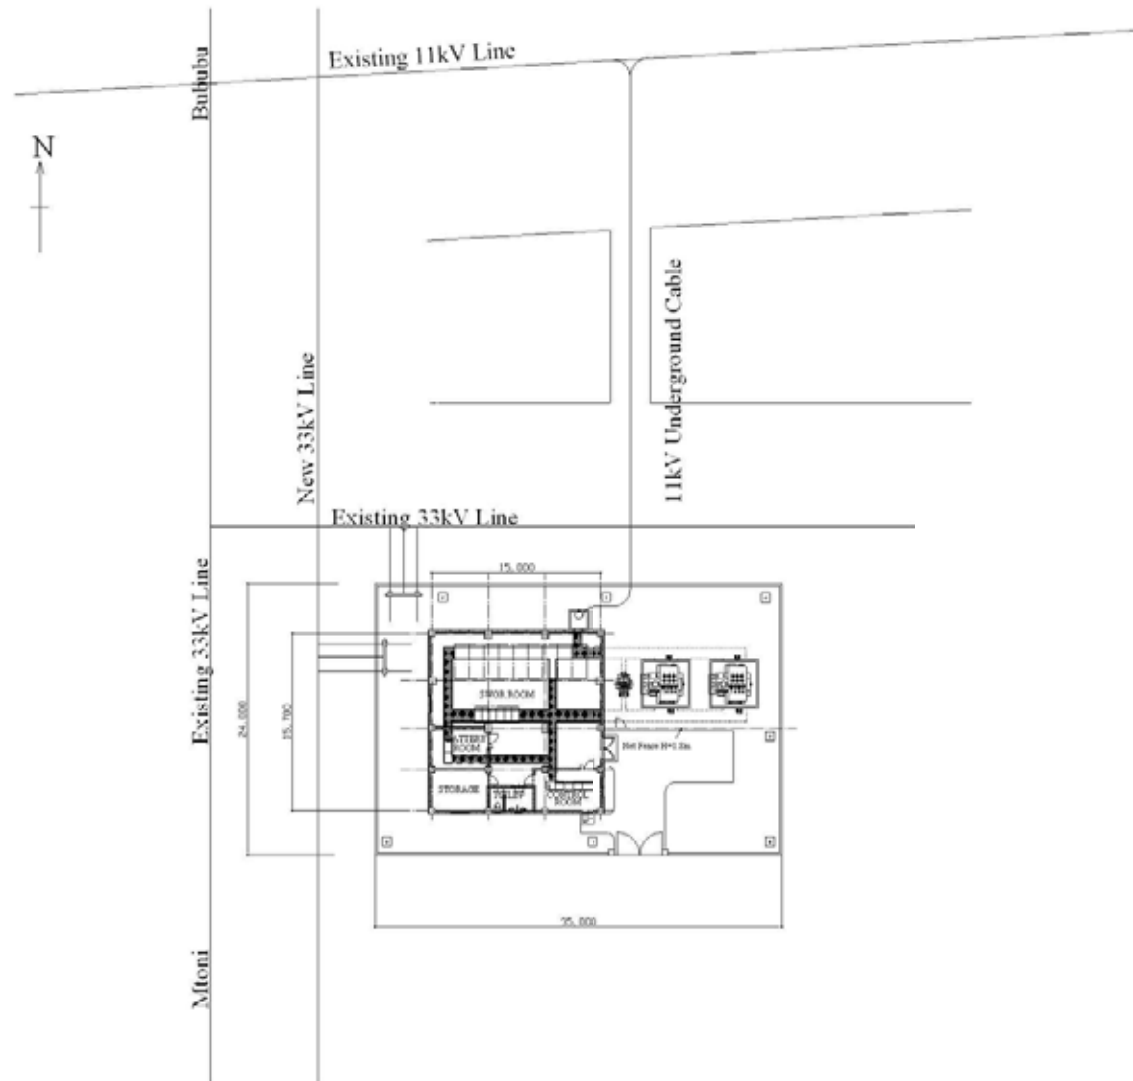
Layout Plan of Mwanyanya Substation
